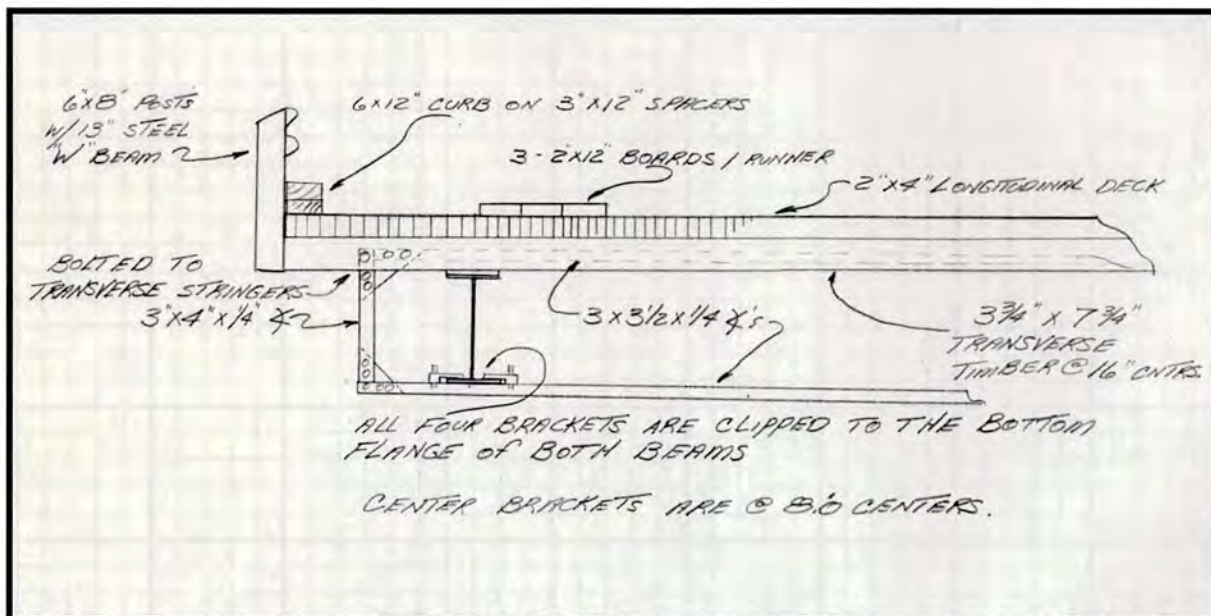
A profile drawing illustrating the method by which the wooden decking of Bridge 140-1.5 is attached to its supporting steel girders. Courtesy of USFS Engineering.
